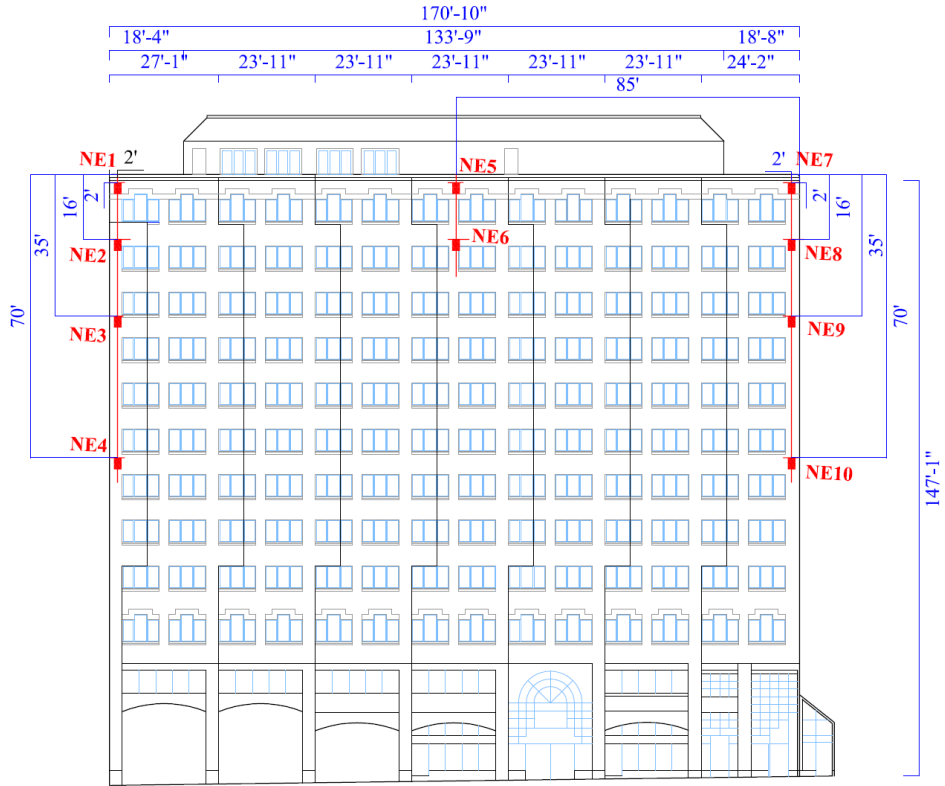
North-east elevation of FB Building with driving rain gauge locations
